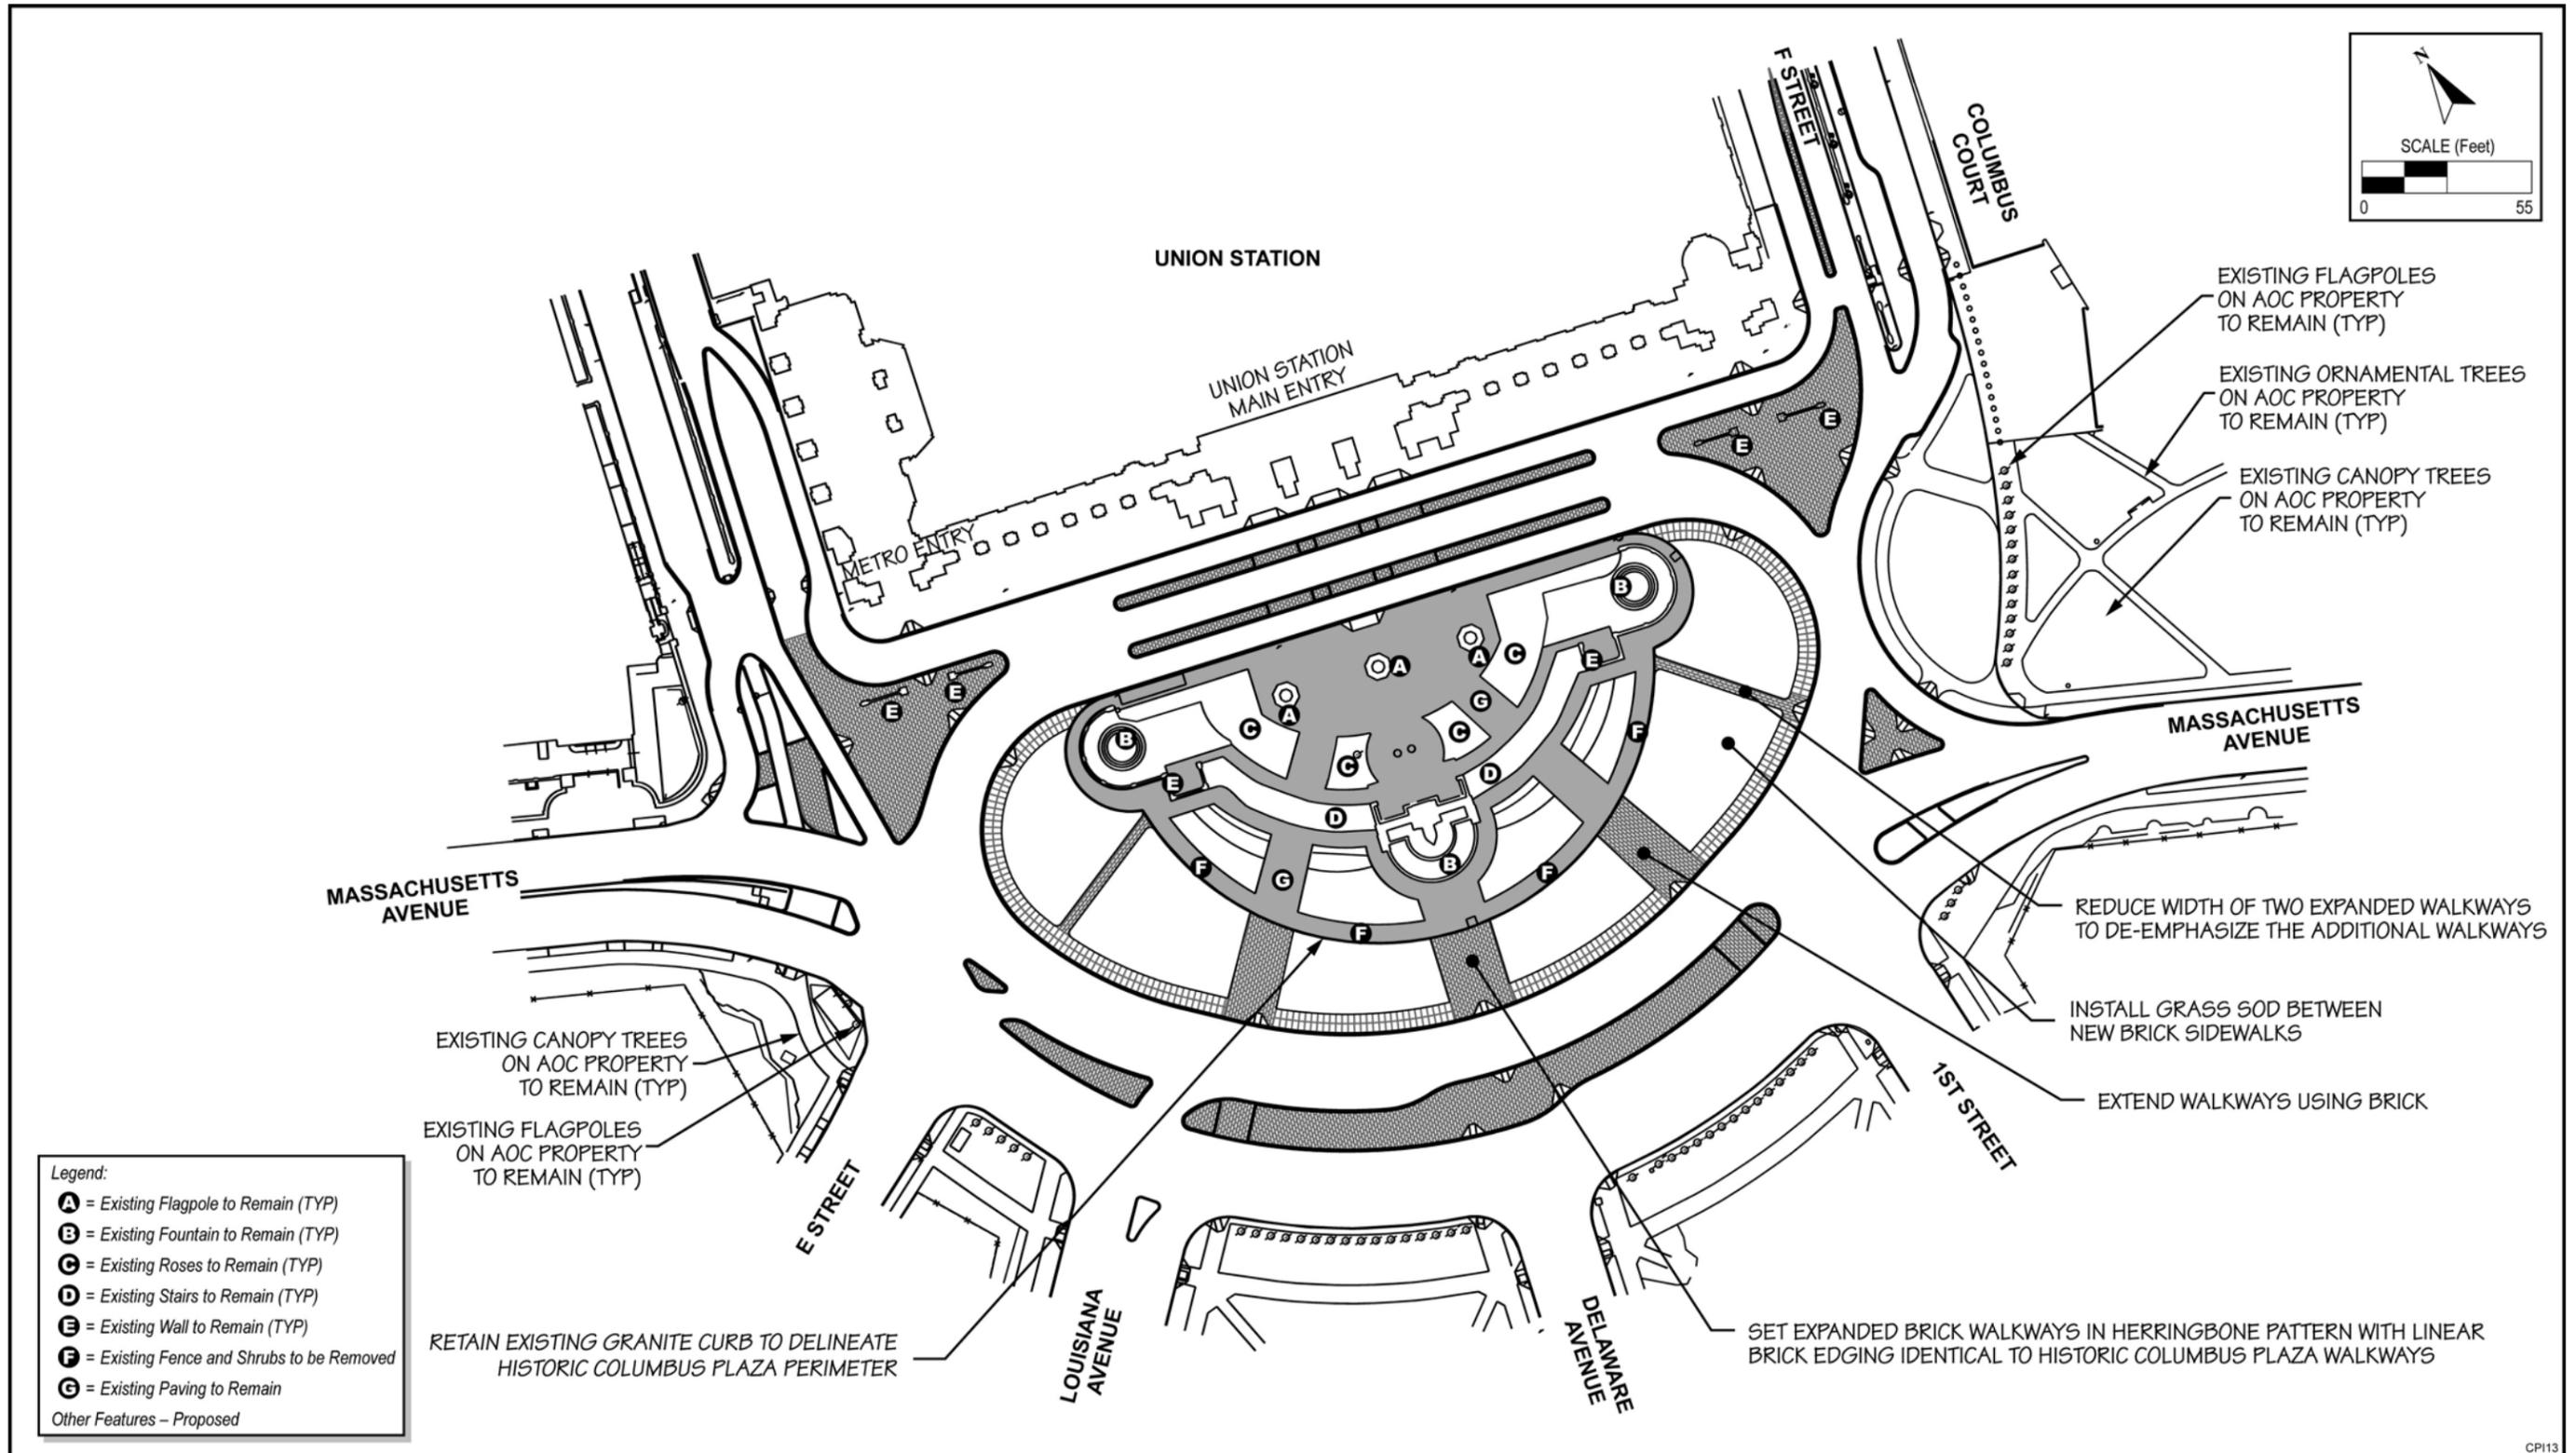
LANDSCAPE PLAN, COLUMBUS CIRCLE/COLUMBUS PLAZA
